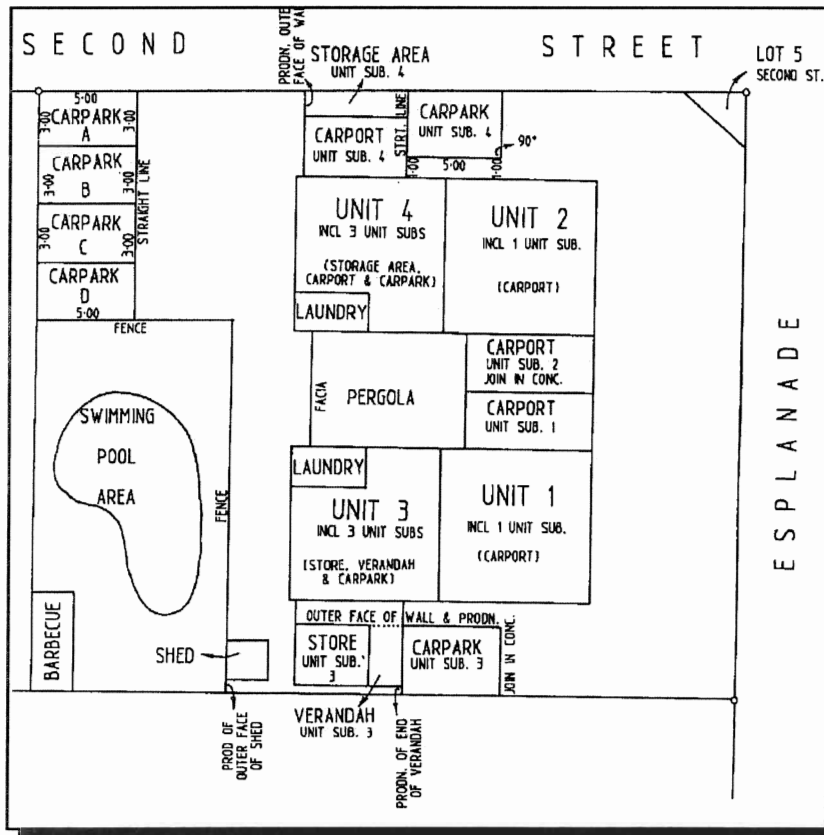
PLAN SHOWING COMMON PROPERTY AREAS AND ARTEFACTS
